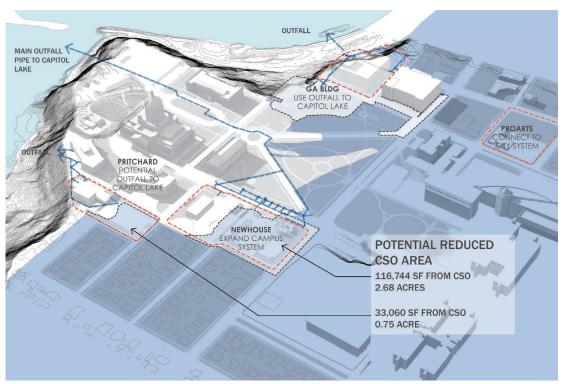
COMBINED SEWER OUTFALL PLAN
